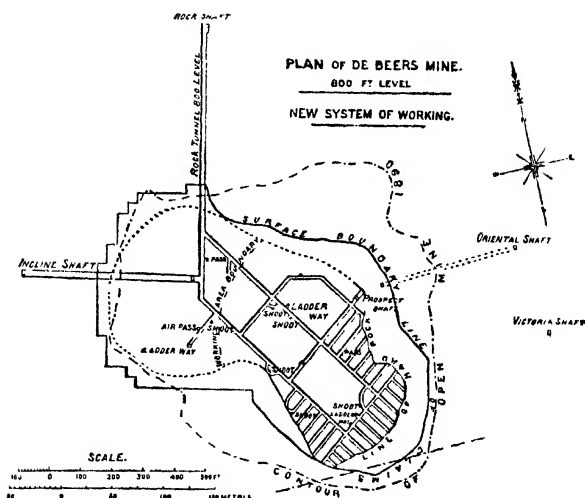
De Beers Diamond Mine. Plan at 800 ft. level.
